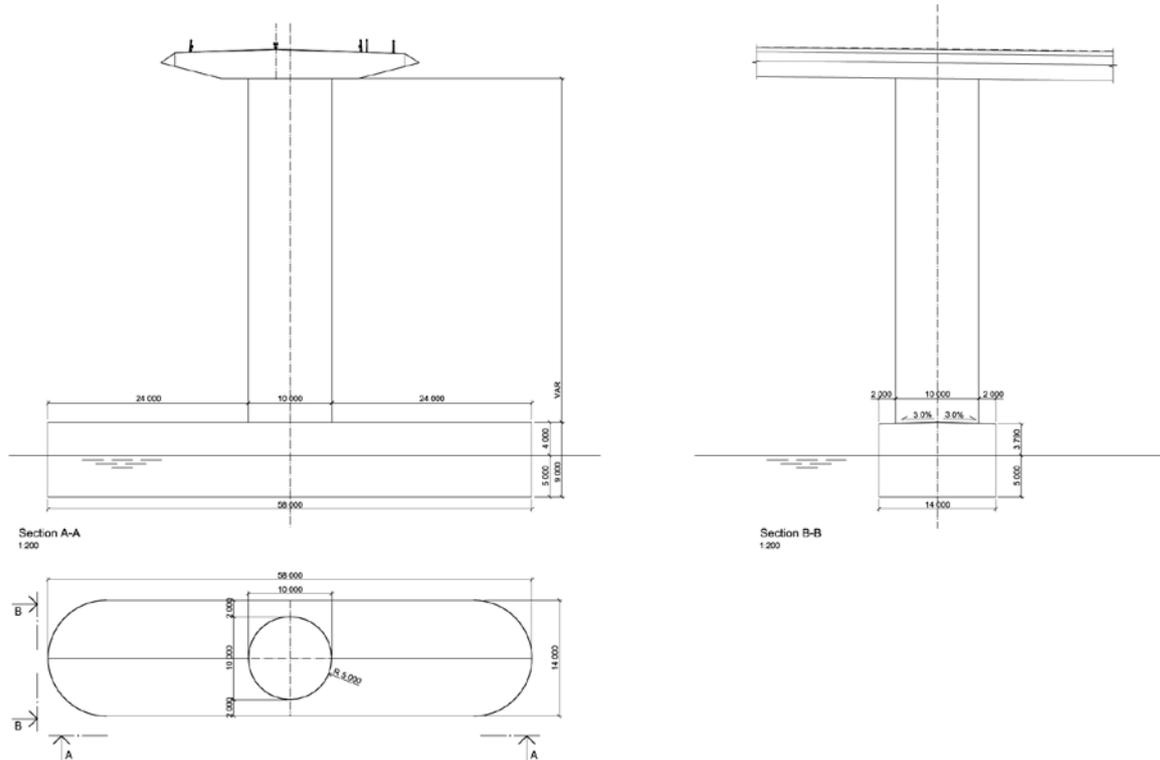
Pontoon and column – dimensions for High bridge (type 3), -DR-052, ref. Appendix A
